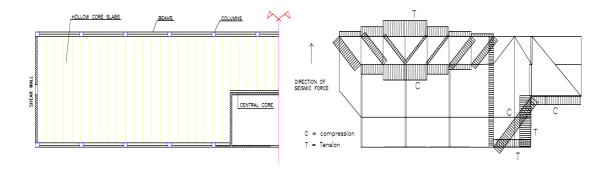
Example of strut-and-tie distribution of diaphragm forces in a hollow-core slabs floor with bracing core and walls
